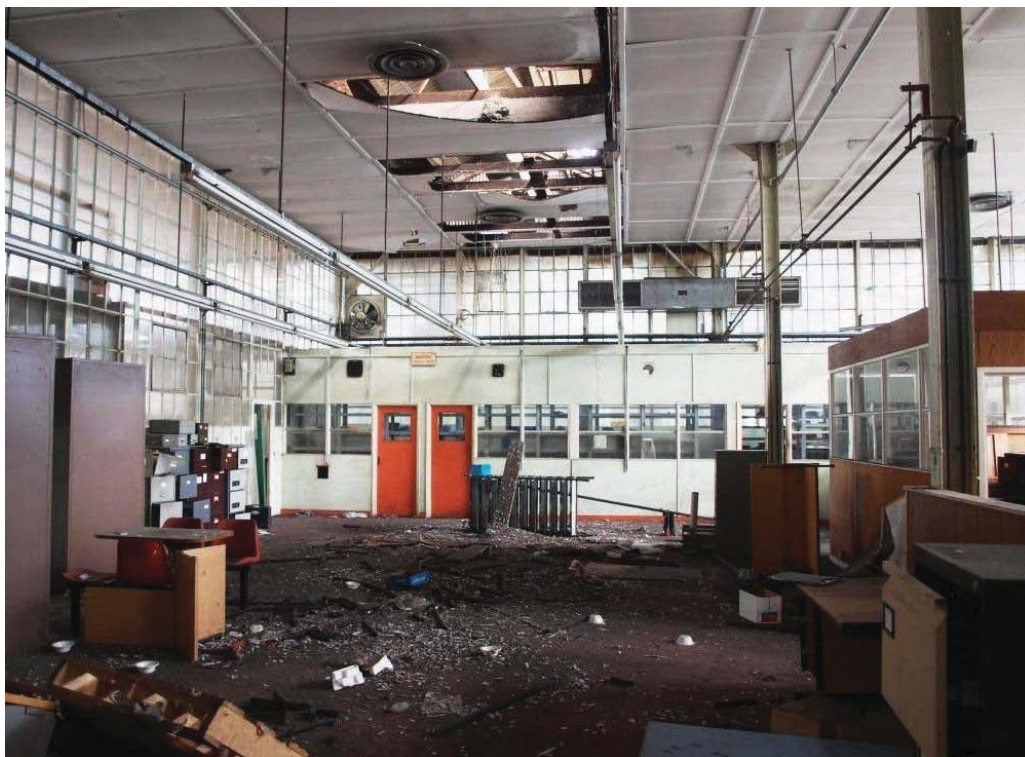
Interior of southern section Building 26, looking north. The building extended northward beyond the gable.
